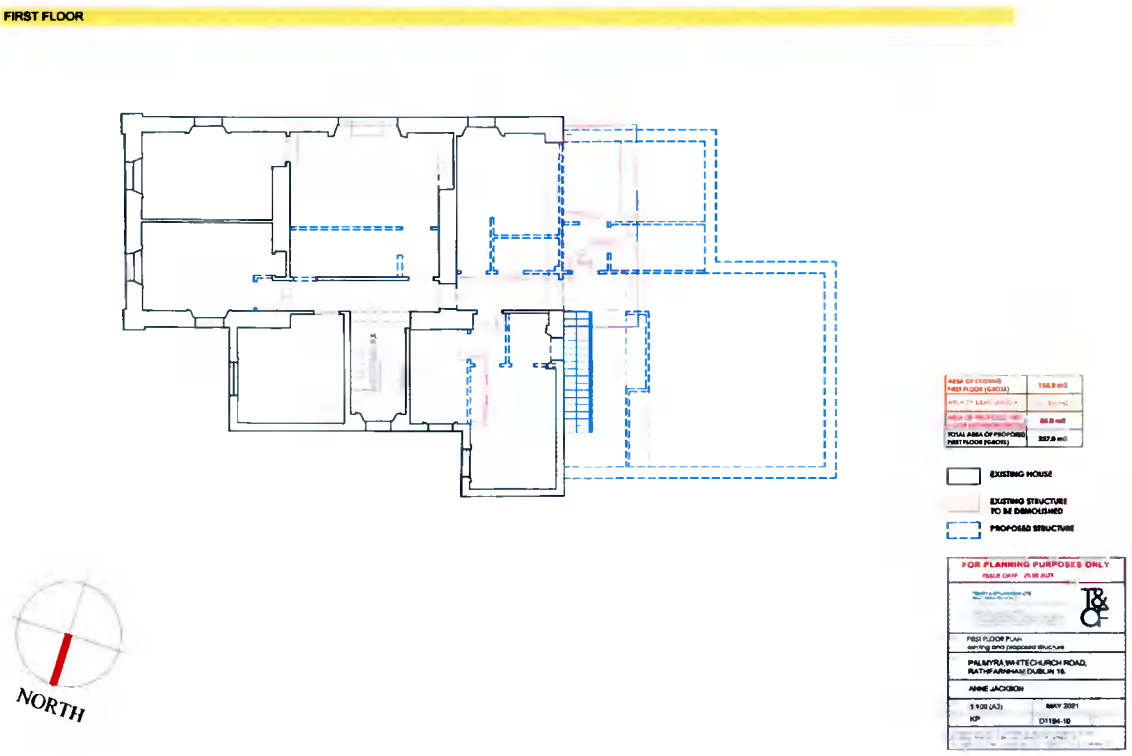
First Floor Plan. Showing proposed changes to existing fabric and new extension and interventions. Not to Scale
